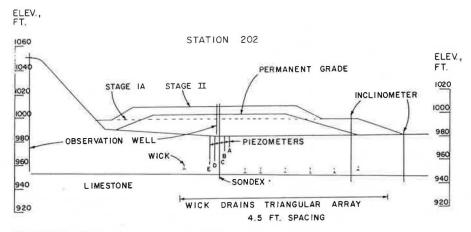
Typical embankment section and instrument locations at Bluff area, Station 202.
